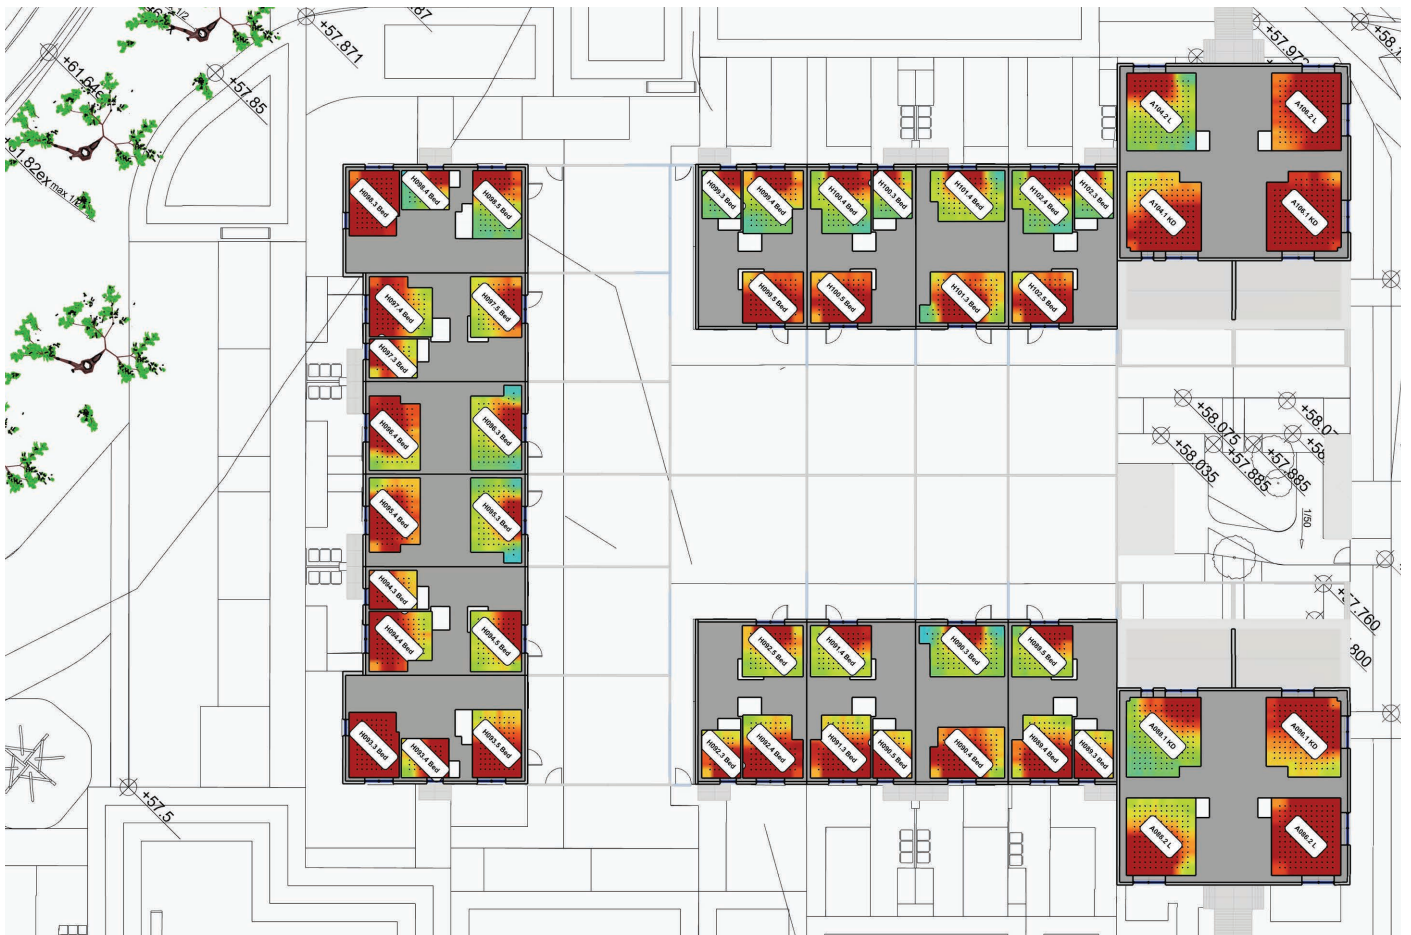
Units 85-106 First floor plans indicating Daylight Provision to EN17037:2018 Table A.1
